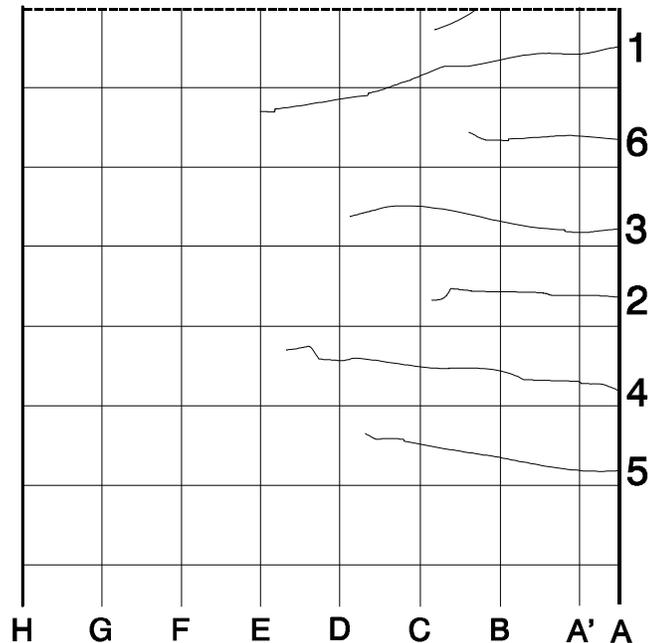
POJ-RC-100 cracking pattern on south face of pier at dead load
